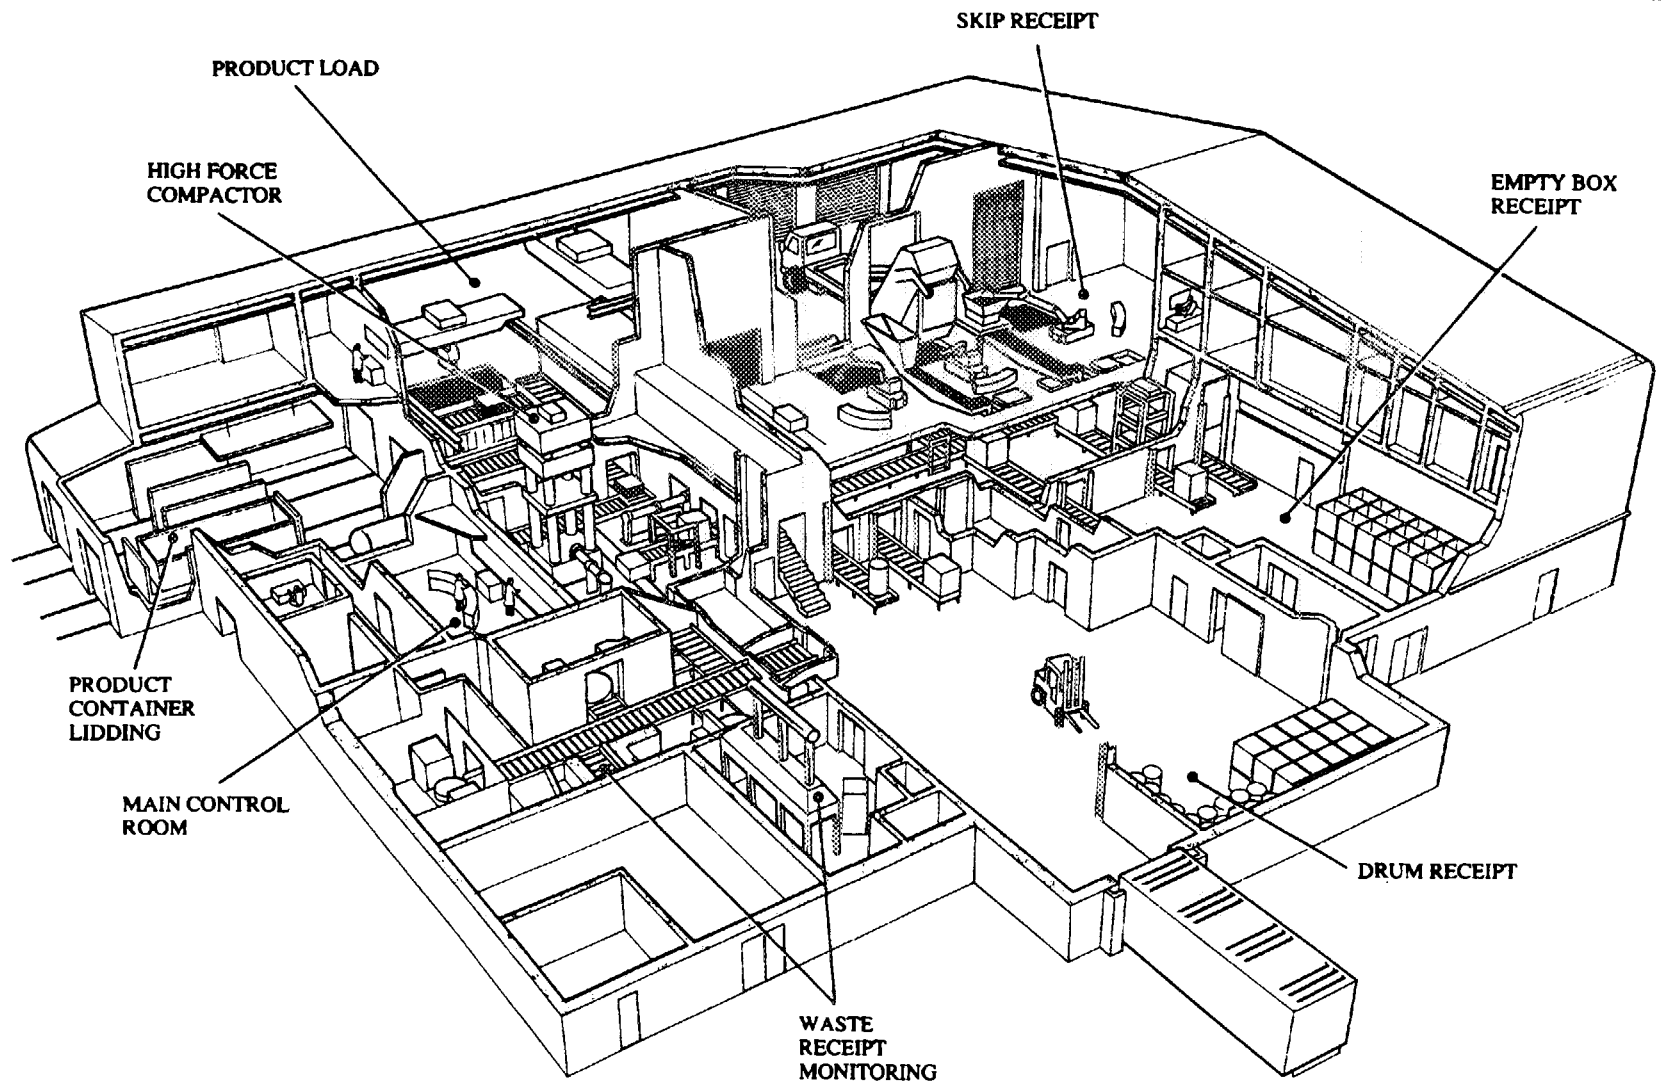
LAYOUT OF THE WAMAC FACILITY
